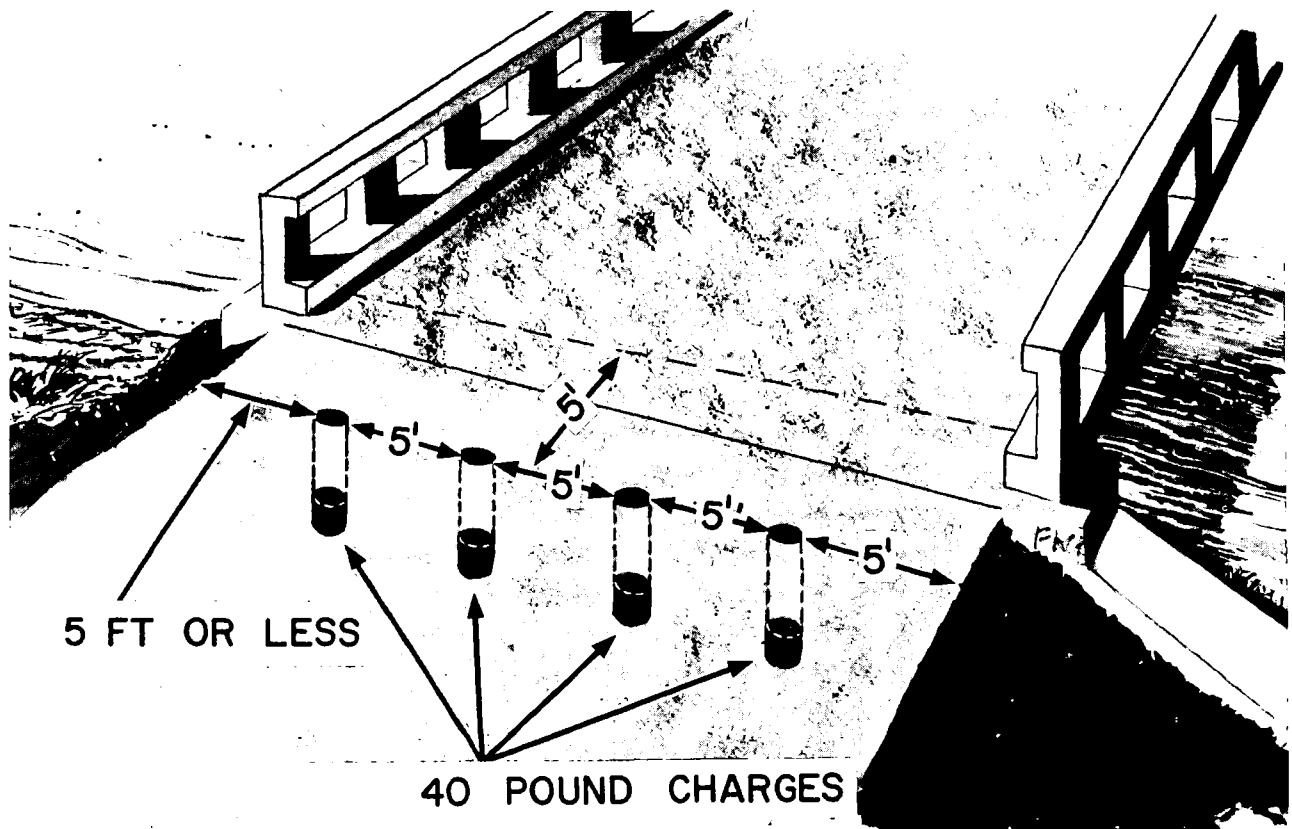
Charges placed in fill behind reinforced concrete abutment 5 feet or less in thickness.
